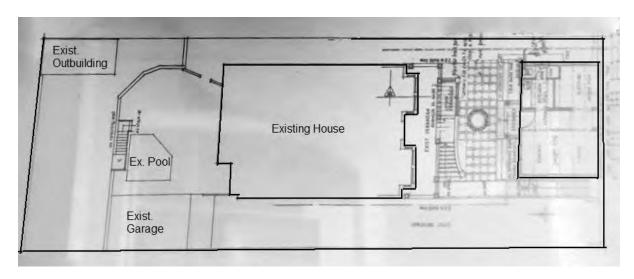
Site Plan of Existing Structures as taken from the approved building plans for the ancillary unit.
